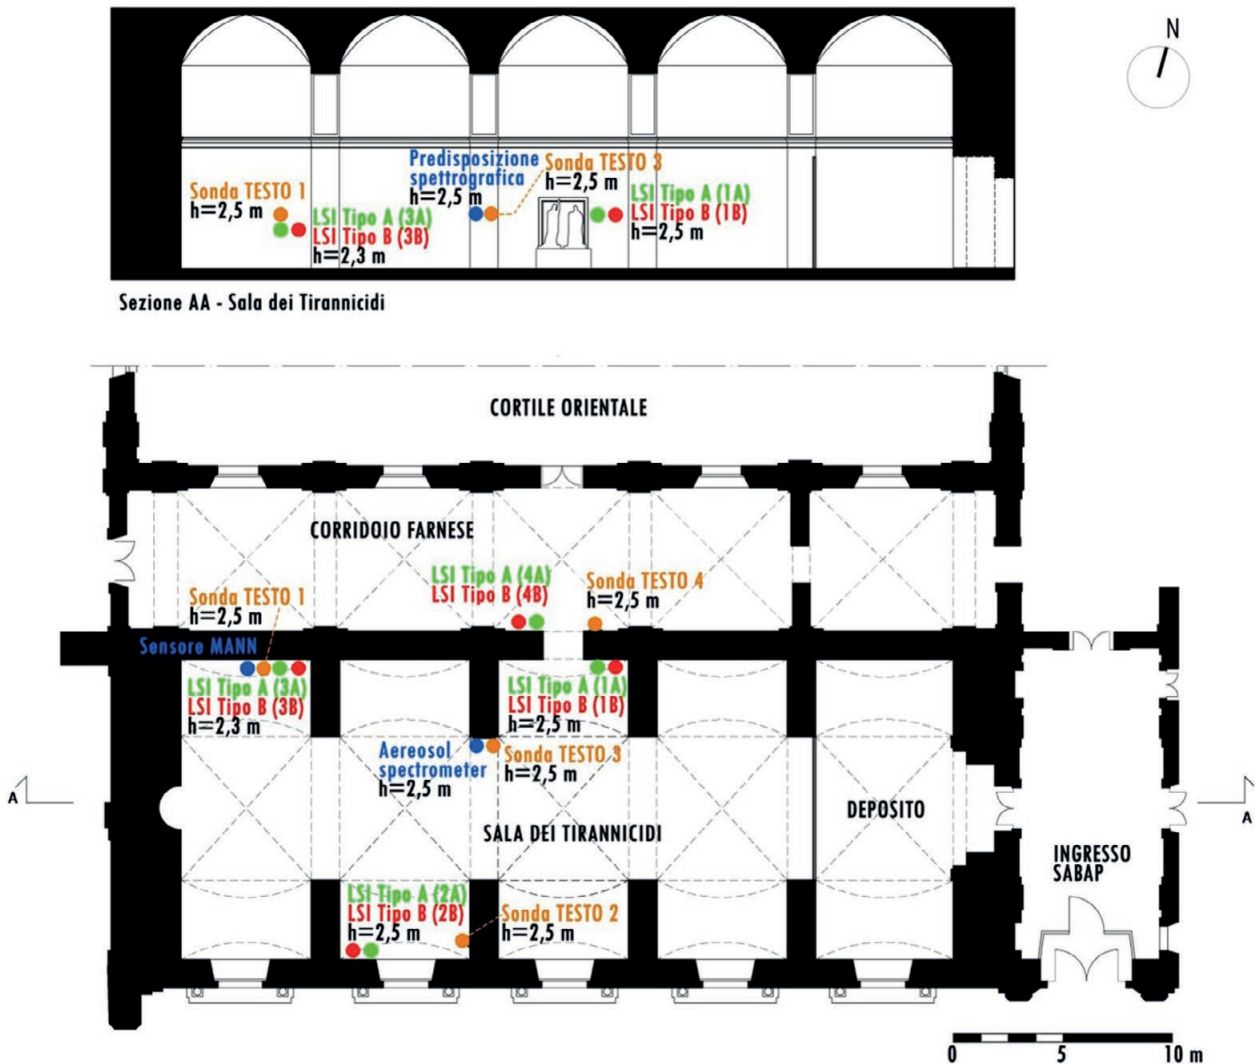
| Vertical section and floor plan of the Tyrannicides Room and adjoining rooms on the ground floor, showing the different types of instruments installed.
